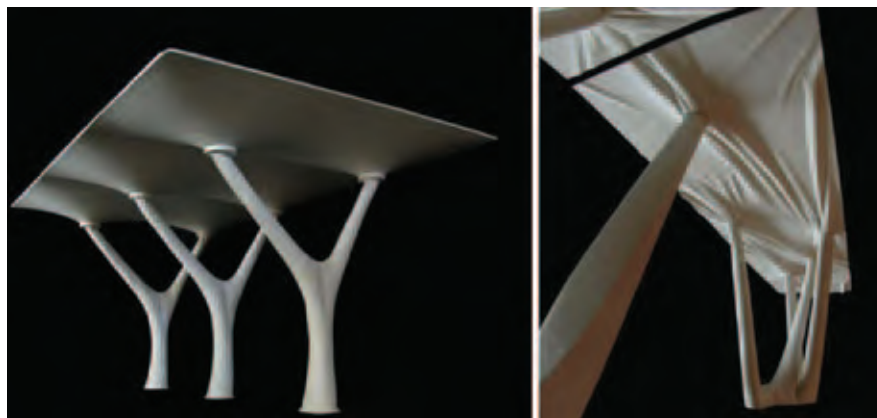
Fabric cast columns supporting fabric formed shells (courtesy C.A.S.T)
